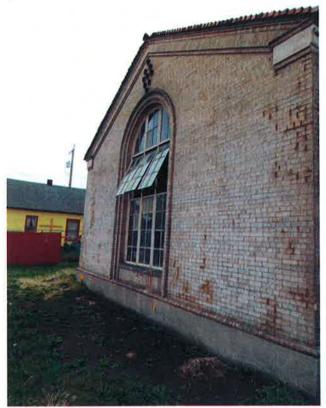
East façade of building - note opened awning style windows (June 3, 2015)
